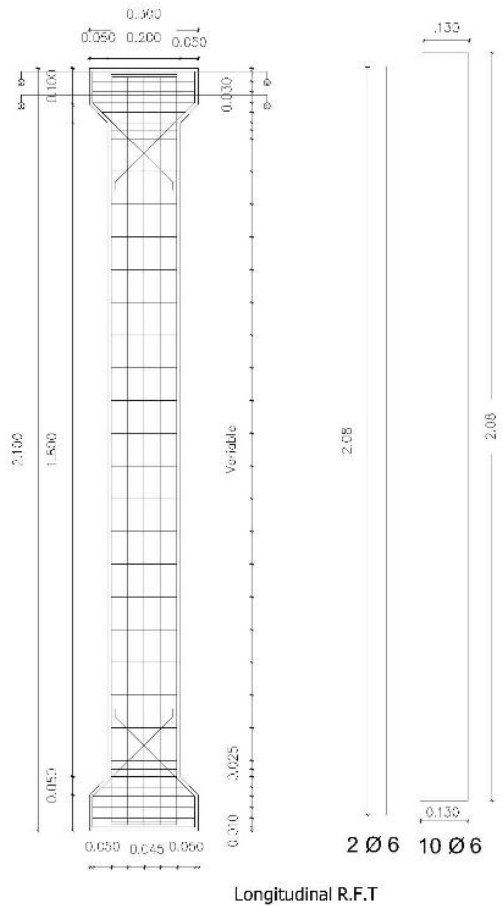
Columns longitudinal reinforcement details for groups (A, B, and C)
